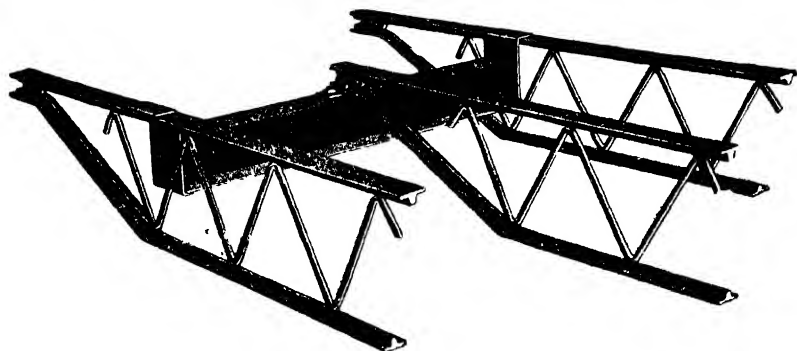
,691 — Illustrating the use of headers for framing around openings. Where small openings (not over 4 ft.) are required in steel joist roof construction, framing can be accomplished by means of special headers. The tail joist is bolted to the top of the header as shown. For openings greater than 4 ft. the framing should be accomplished by means of structural steel.
